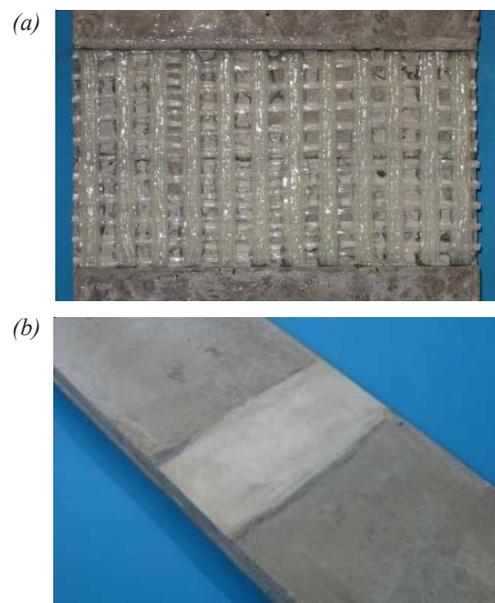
Bonded textile straps (a); and the final key and slot concrete member with subsequent grouting (b)
